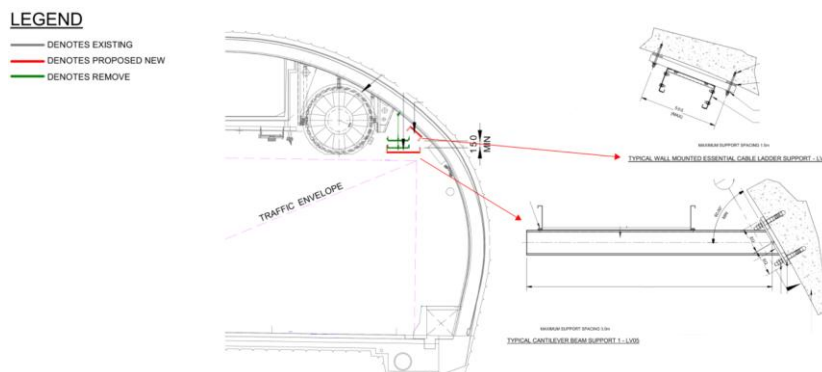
Cable route design near jet fans – Cantilevered & Wall mounted arrangement.
